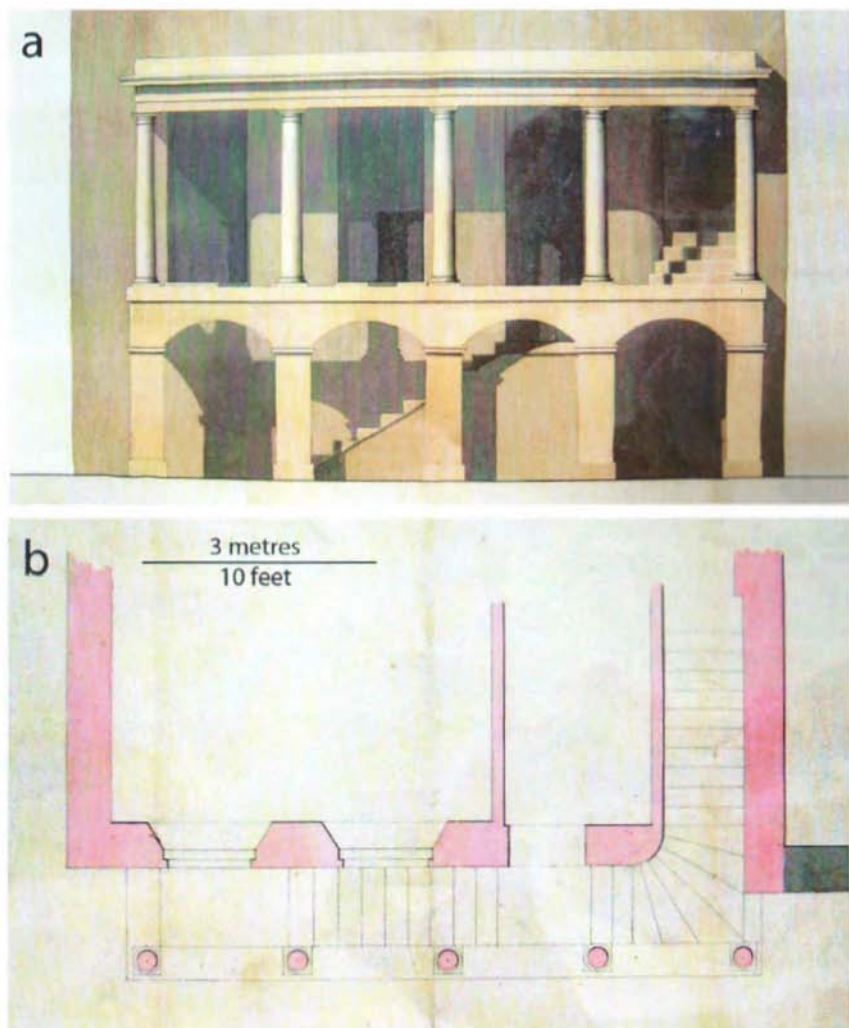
(a) Front Elevation and (b) Plan of Final Proposed 1815 Modifications to Dr Barclay's Building at 10 Surgeons' Square to Show the Layout of Alterations to the Front and First Floor.
